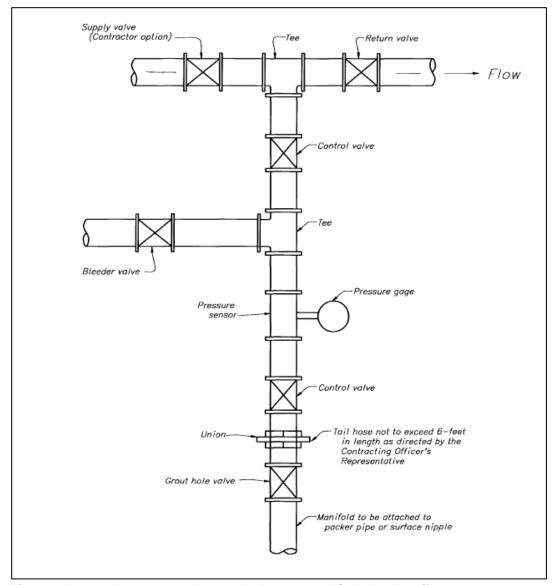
Reclamation's standard grout manifold drawing (flowmeter not shown).
